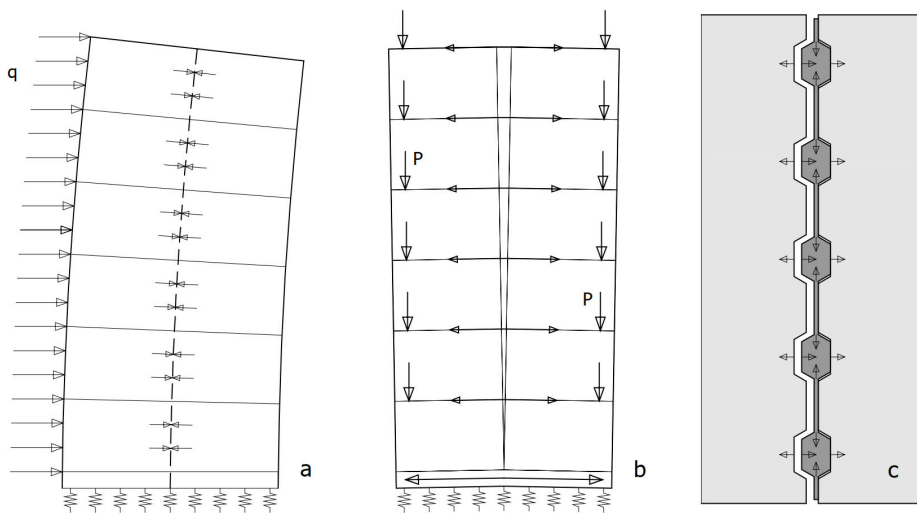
Precast concrete cantilever shear wall structure imposed with a distributed lateral line load  $q$  resulting in lateral compression forces on the vertical mortar connection (a), lateral tensile forces and dilation due to the point loads  $P$  (b) and shrinkage of the precast concrete and joint concrete (c)
